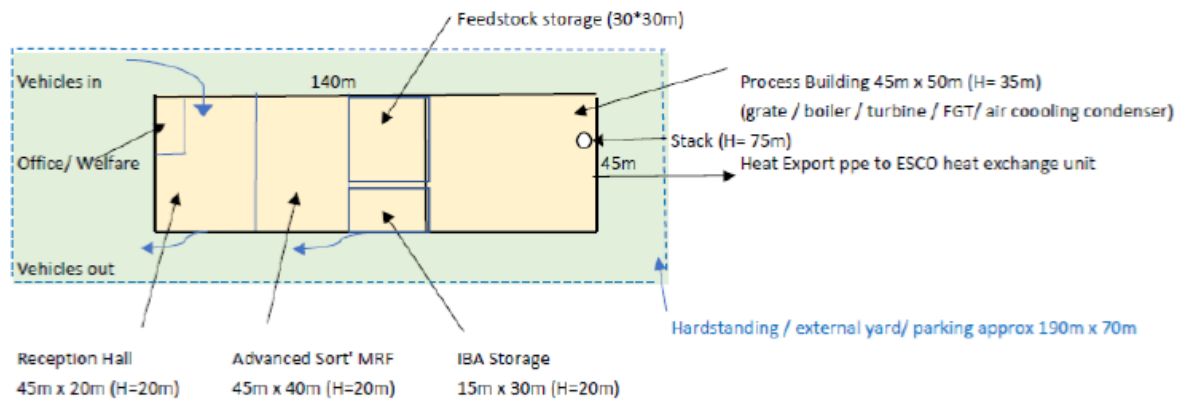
Longman EfW Plant, Indicative Layout/Configuration Sketches
